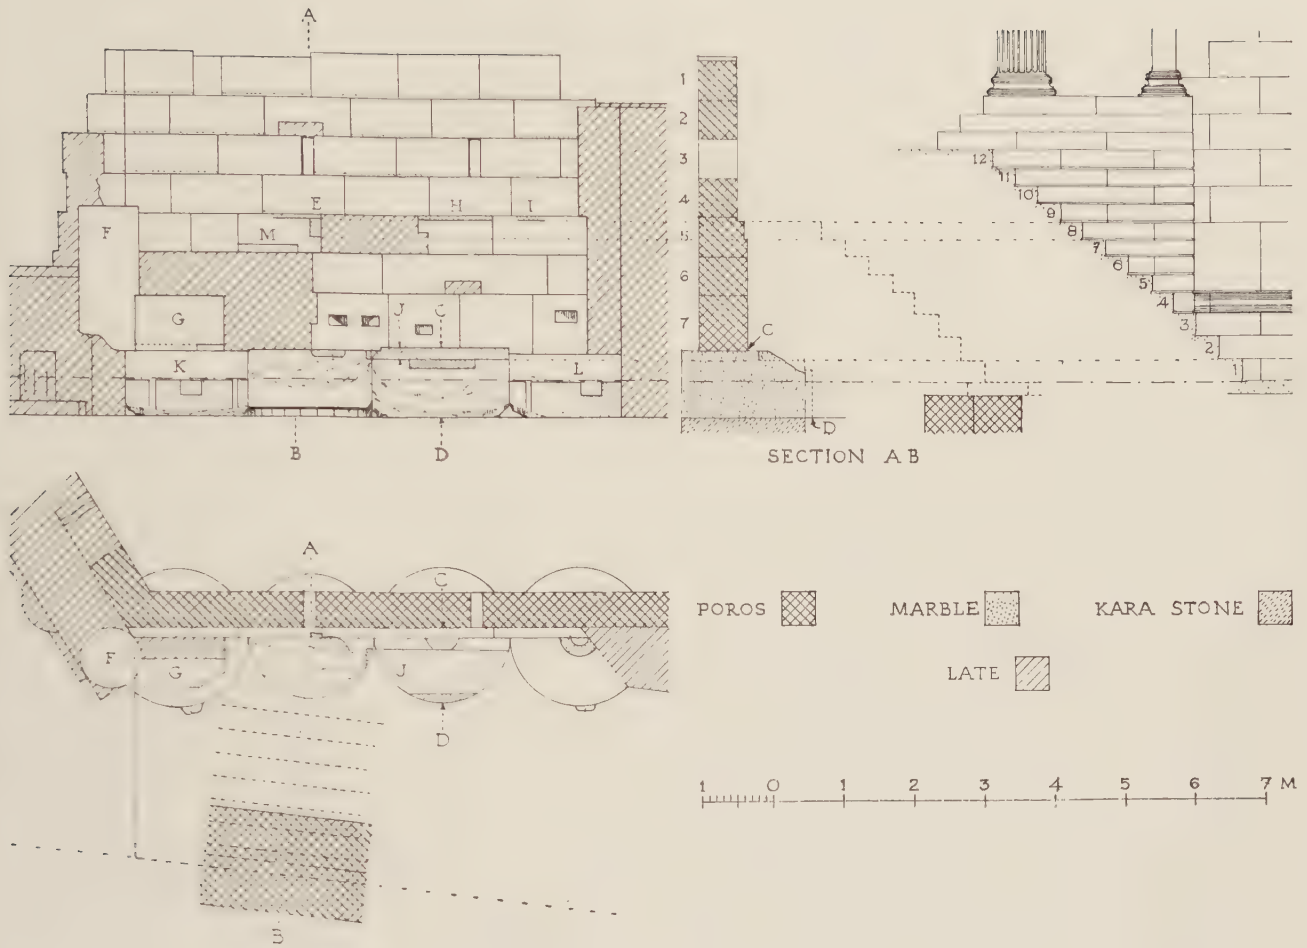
Actual Condition of the Acropolis Wall North of the Paved Area: Plan, Elevation of South Face, and Section. Restoration of the North Face of the Podium of the East Portico
